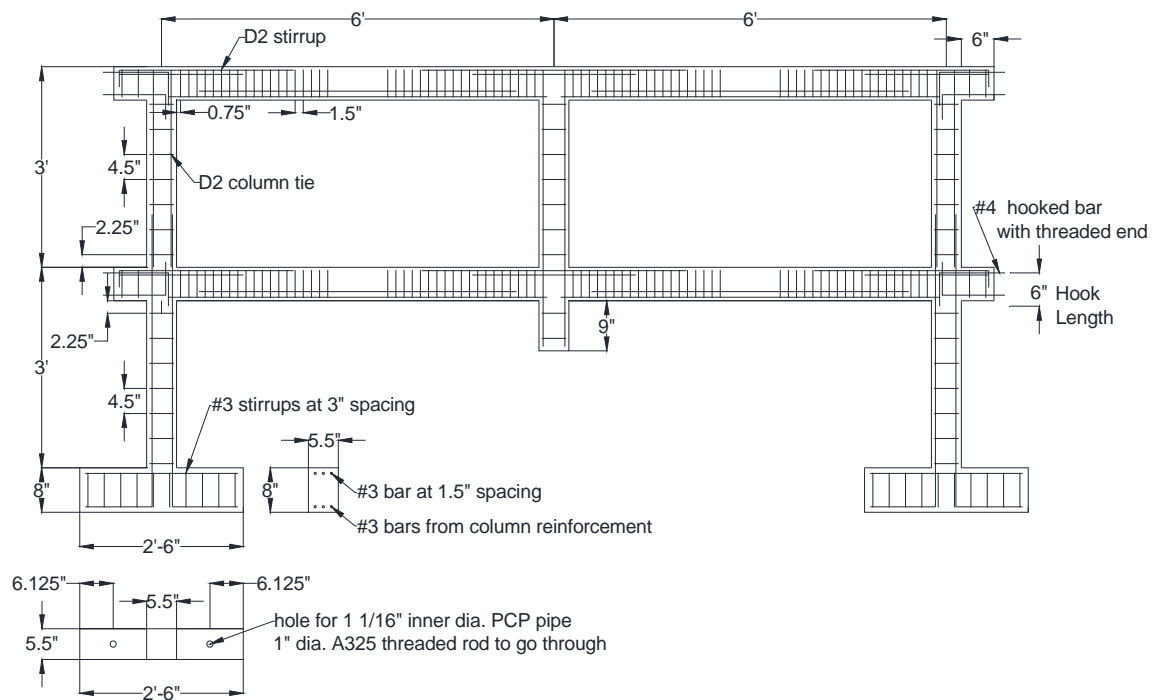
Transverse reinforcement layout for discontinuous reinforcement test frame
